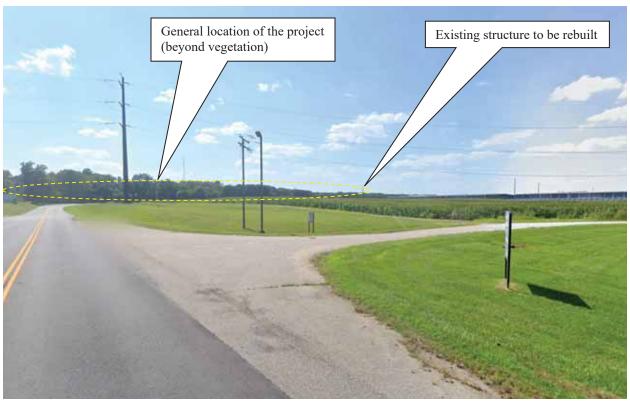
Photo location 7- View from Bermuda Hundred Road towards the project, facing northwest. (One existing structure to be rebuilt is visible; rest of project is anticipated to be screened by vegetation)
